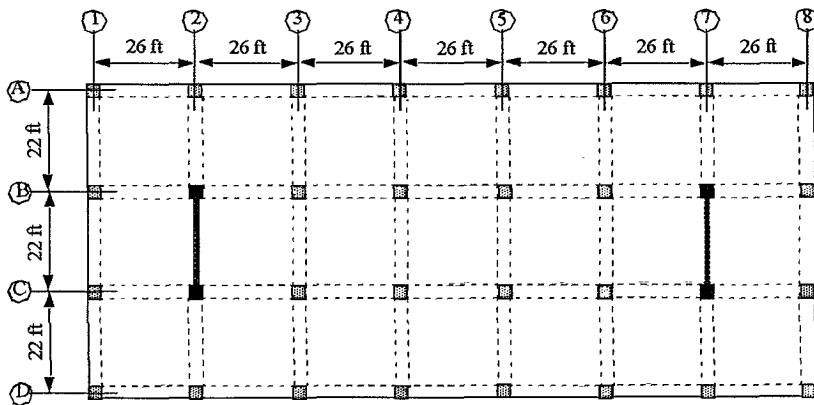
(b). Floor Plan of Office Building Studied – Buildings #8, #9 and #11
